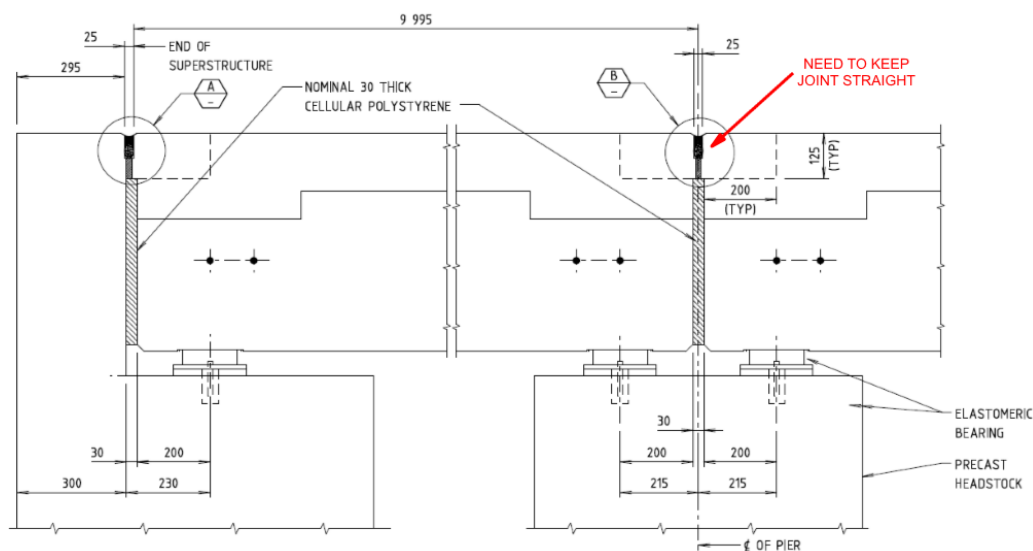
Joint detail at Abutments and Piers (RMS [annotated], 2016)
